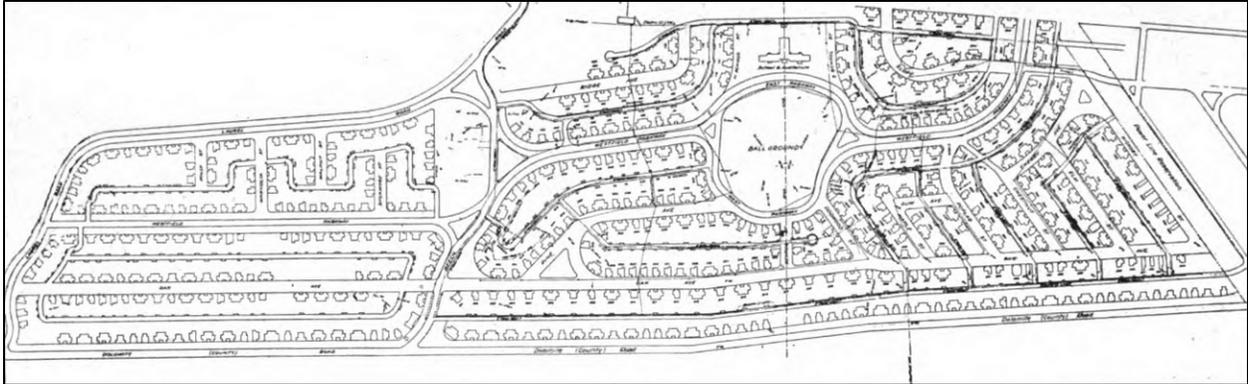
Westfield, Alabama site plan. *Source:* USS 1918, 77.
